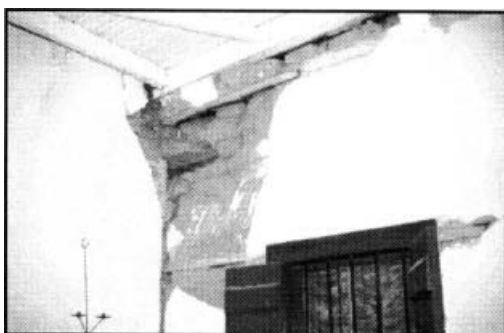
Damage to the adobe at the reentrant corner of the L-shaped main residence. The adobe at this intersection was severely broken and some of the adobe spalled.
